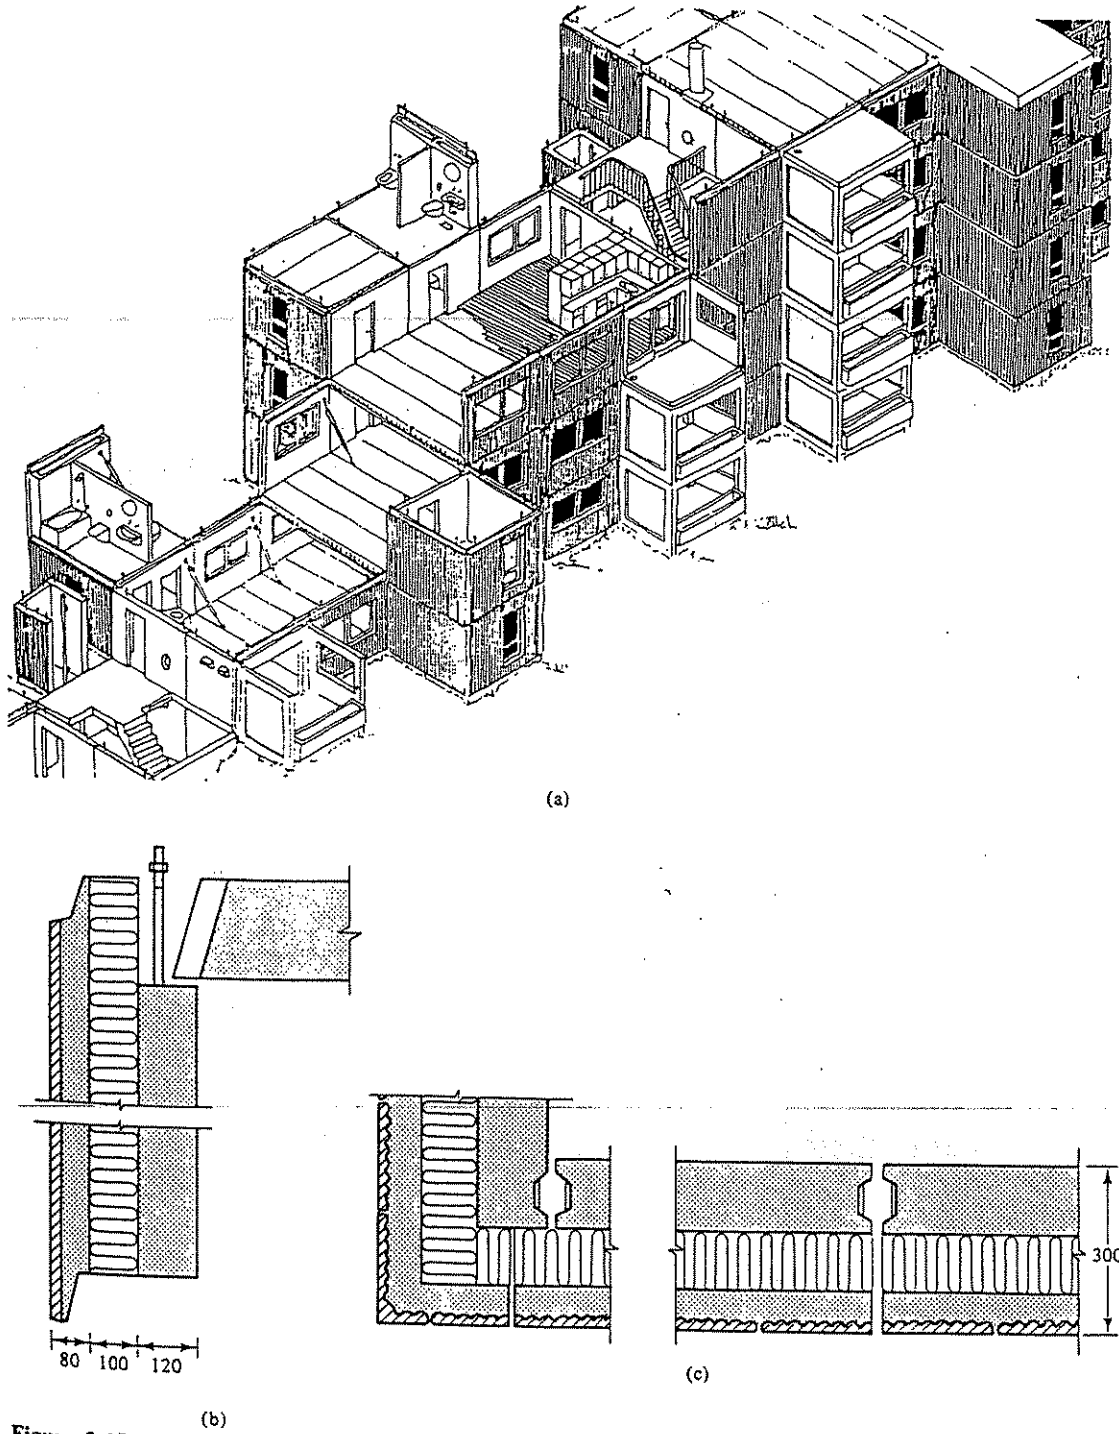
Hojgaard and Schultz system: (a) axonometric view, (b) vertical section through wall and joint, and (c) horizontal section through wall and joint.
